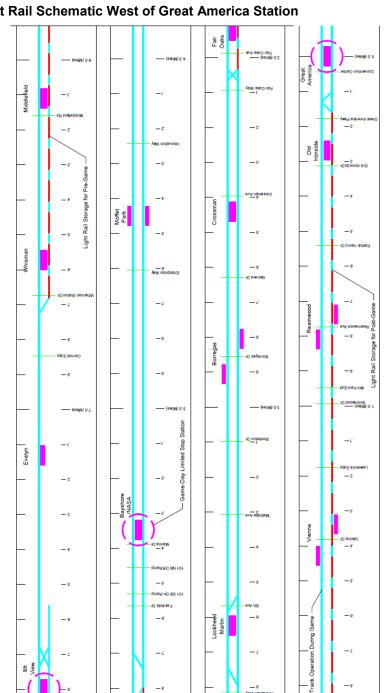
VTA Light Rail Schematic West of Great America Station
